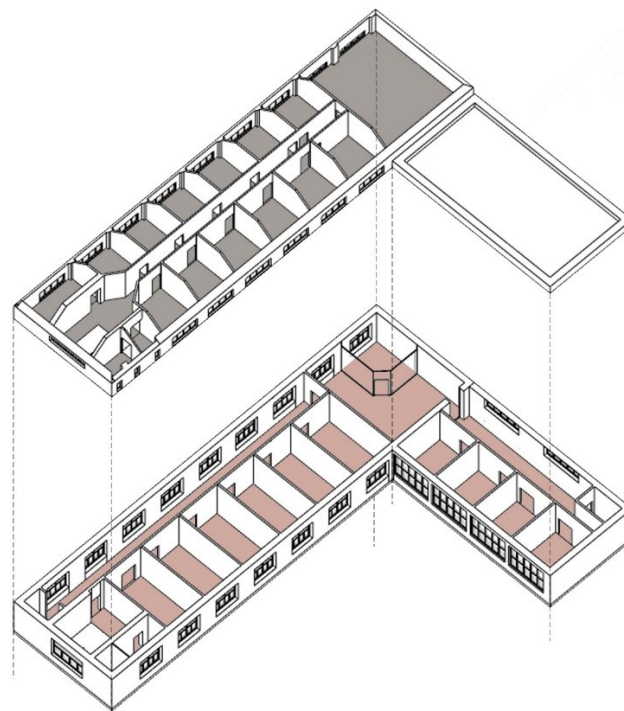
Third and fourth floor plans and perspective of the Energy Department building
